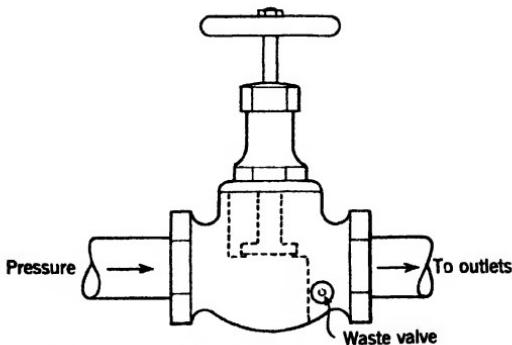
Method of installing a stop-and-waste valve. The waste valve should be on the outlet side as shown.
